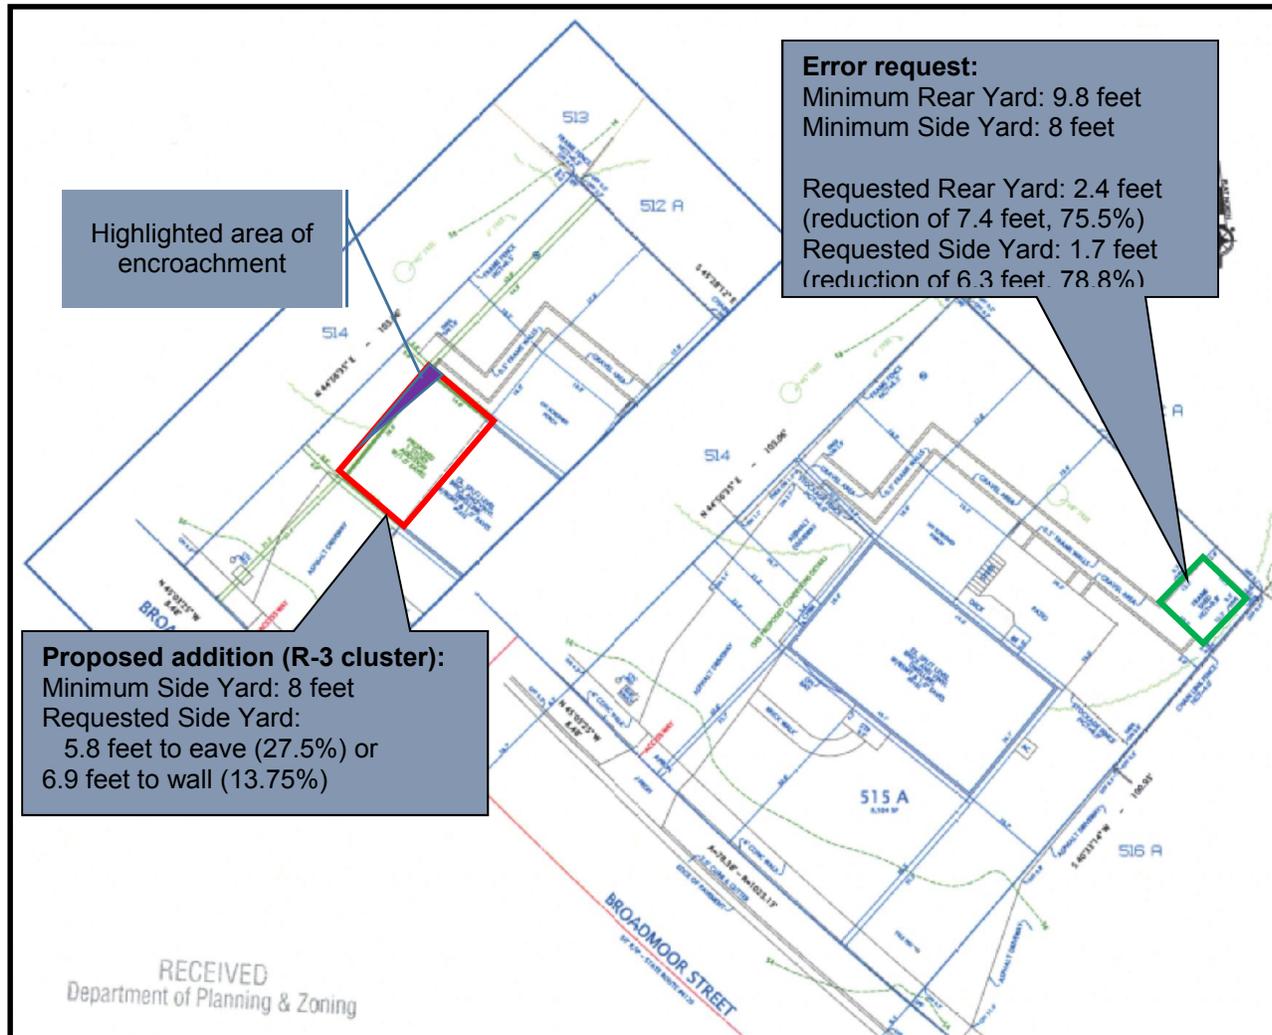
Special Permit plat, partial, showing the proposed addition and the shed proposed for errors in building location. Source: Applicant.
